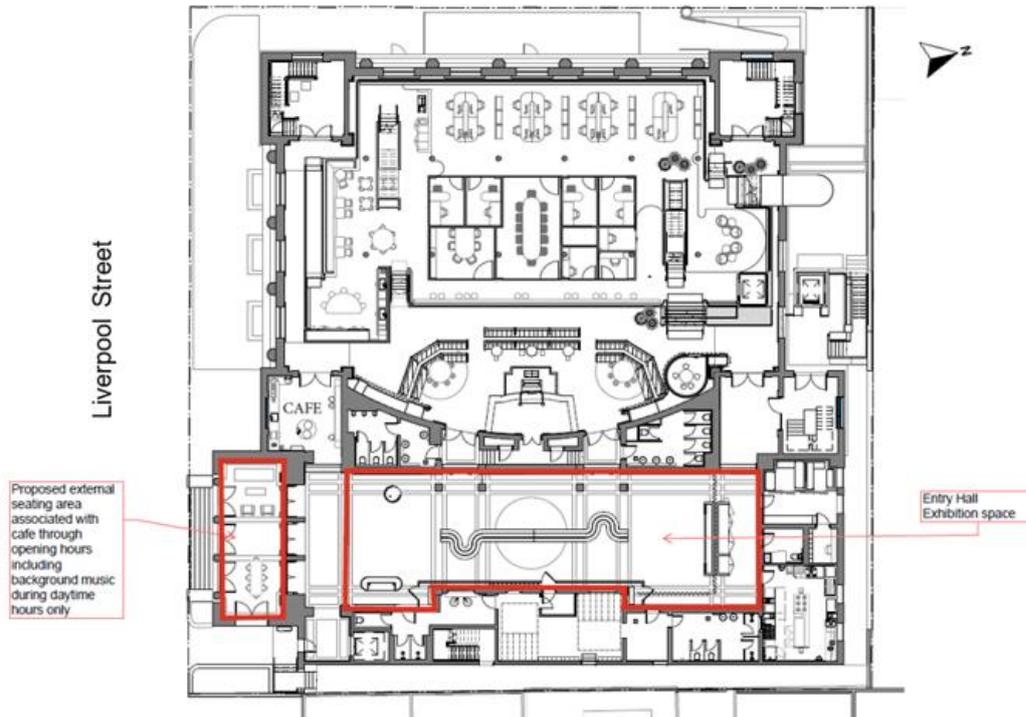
Ground floor plan with Entry Hall and Portico seating highlighted
